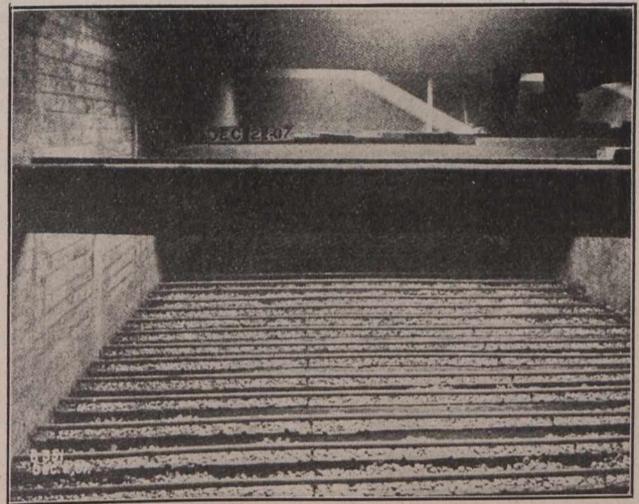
Filter, Scraping Machine, Pittsburg, Pa.
